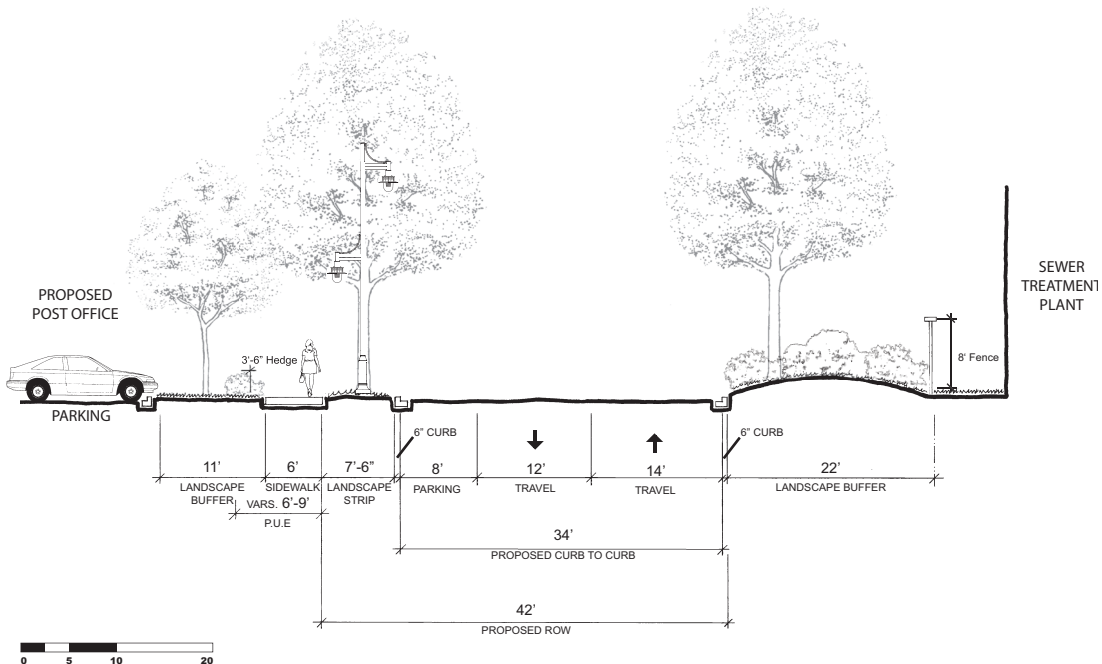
B.25: Solano Avenue Cross Section with Landscape Buffer - Alternative 1
